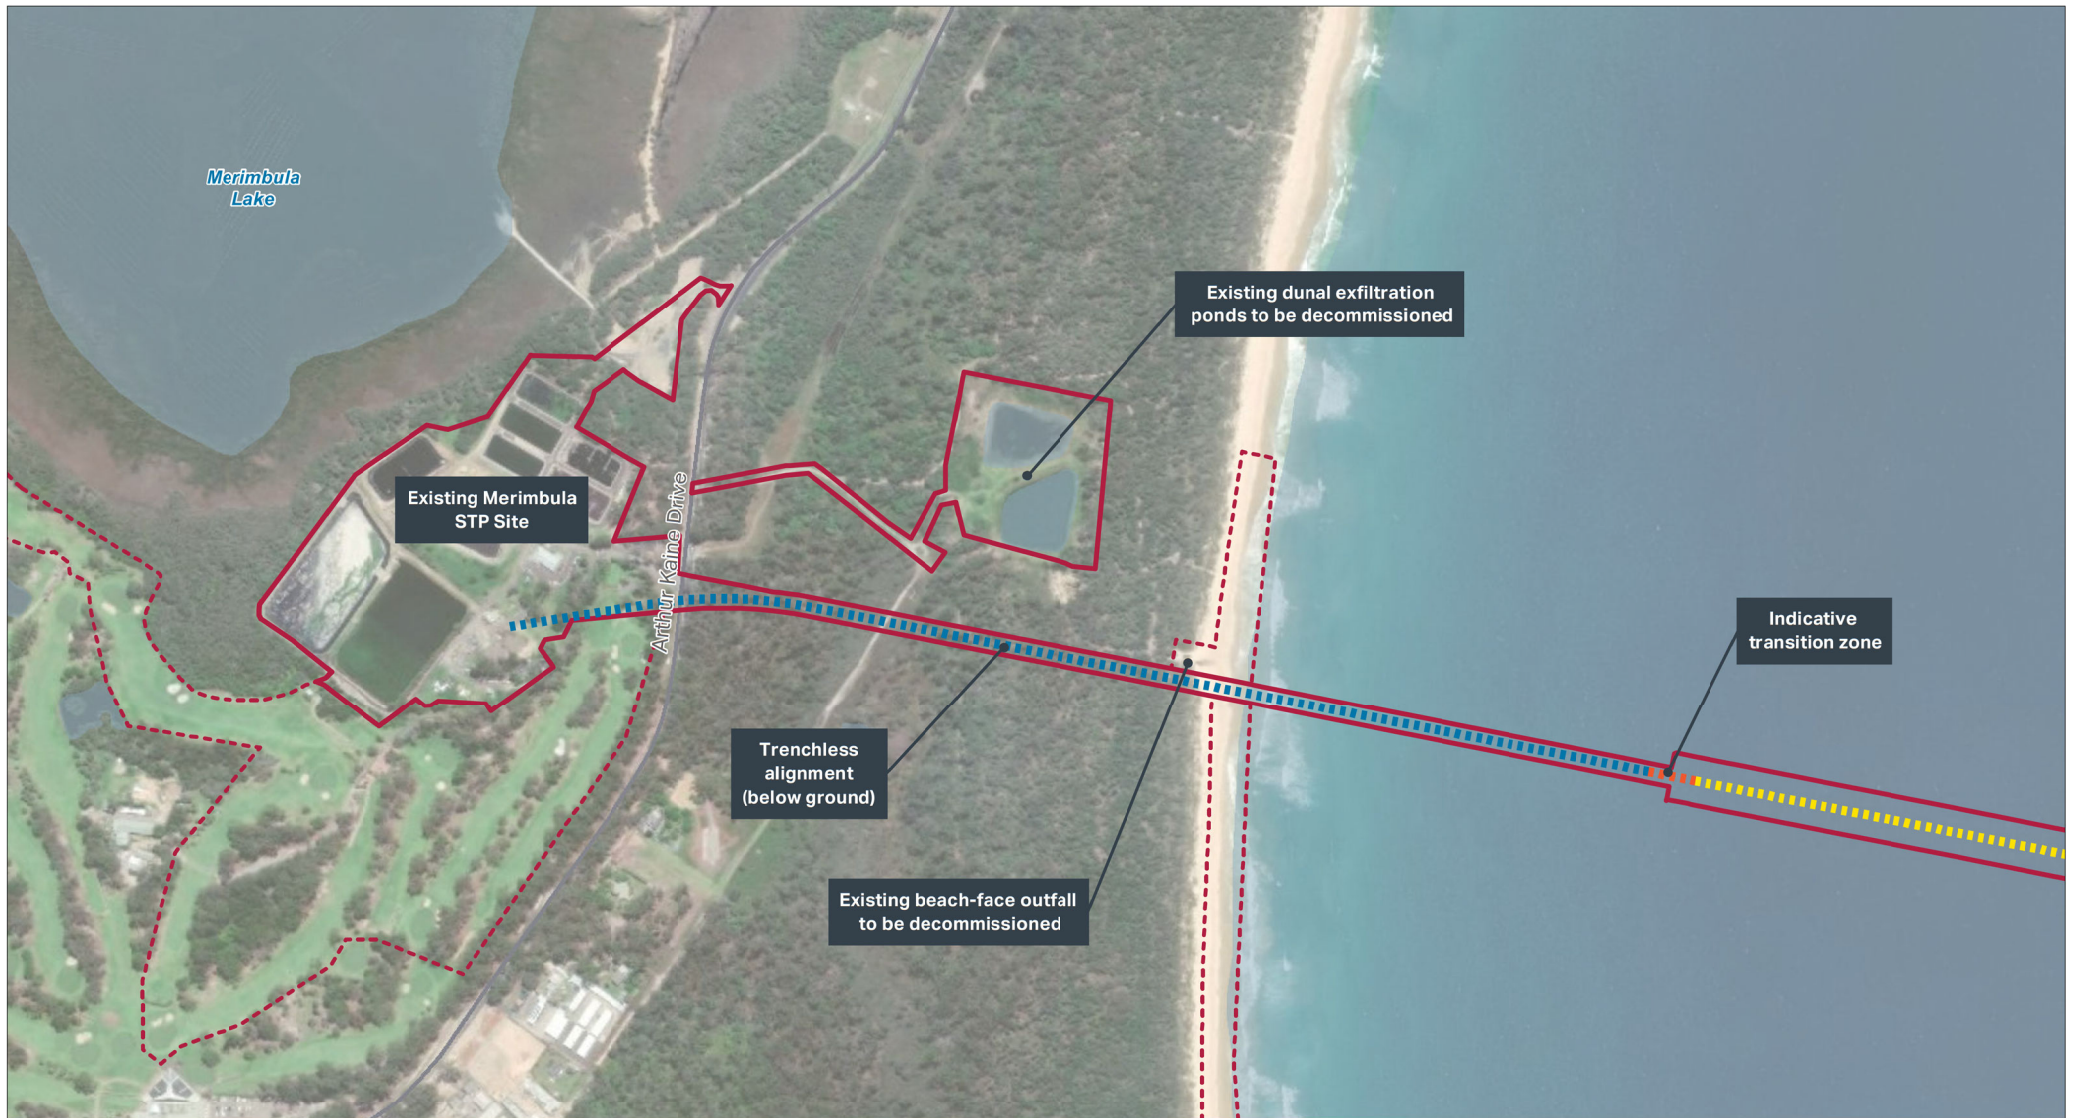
OCEAN OUTFALL PIPELINE - SECTION 1 (BELOW GROUND)
